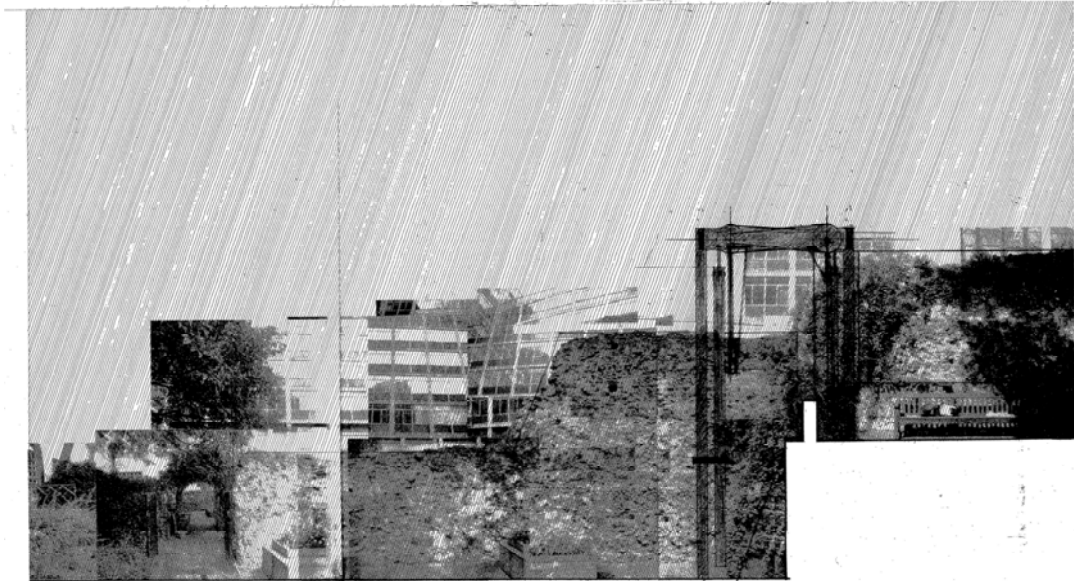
Proposed portico and chimes, west staircase, section looking north towards the fragment of city wall.
